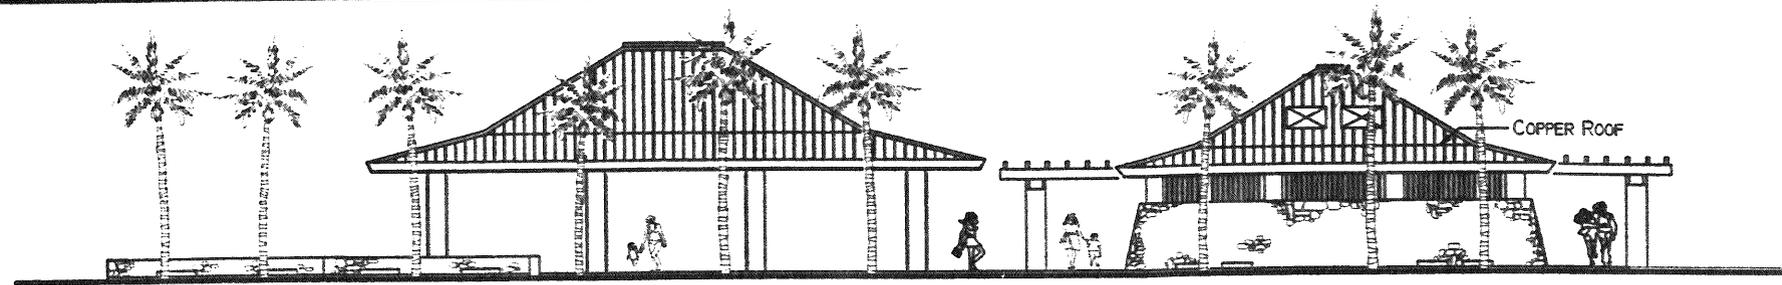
NEW PAVILION AND COMFORT STATION
